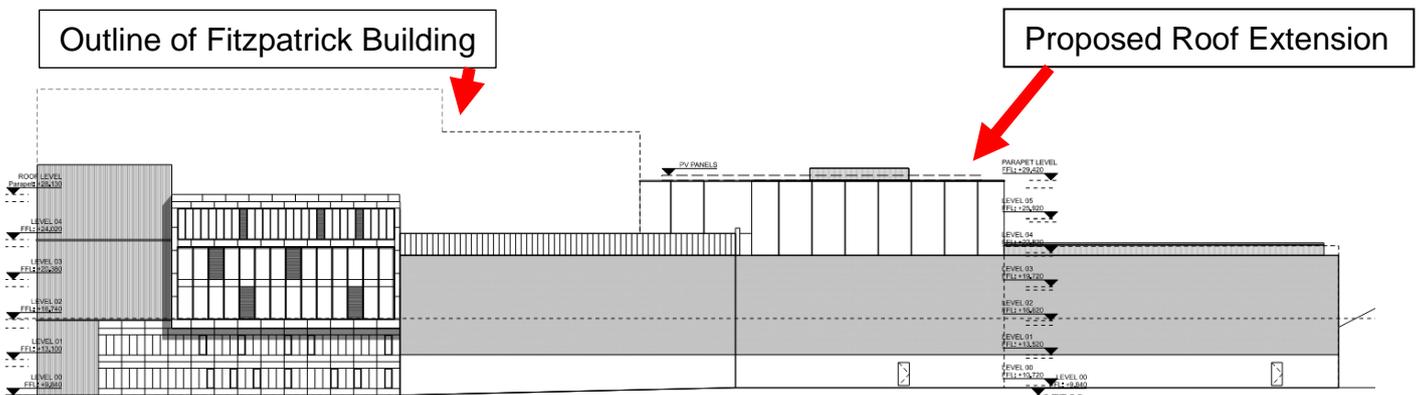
Proposed Southern Elevation of 184 York Way and 14-22 Vale Royal
